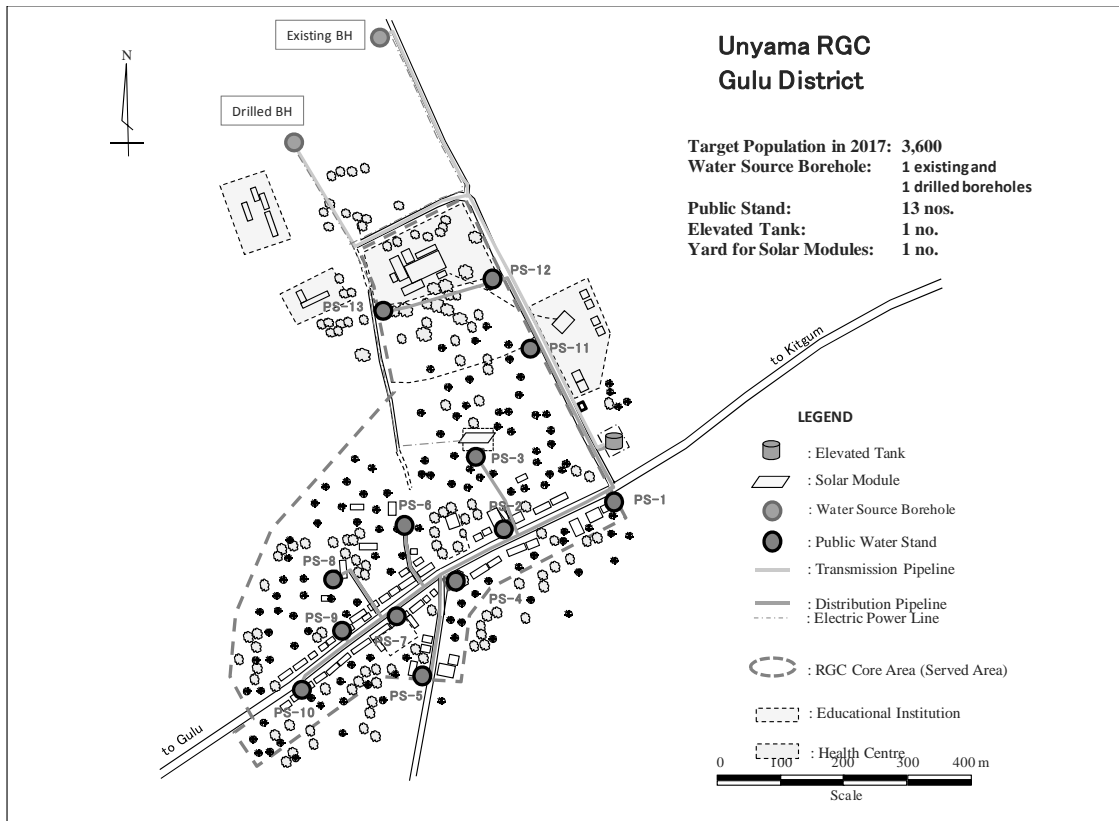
General Plan of Piped Water Supply Facility (Unyama RGC)
